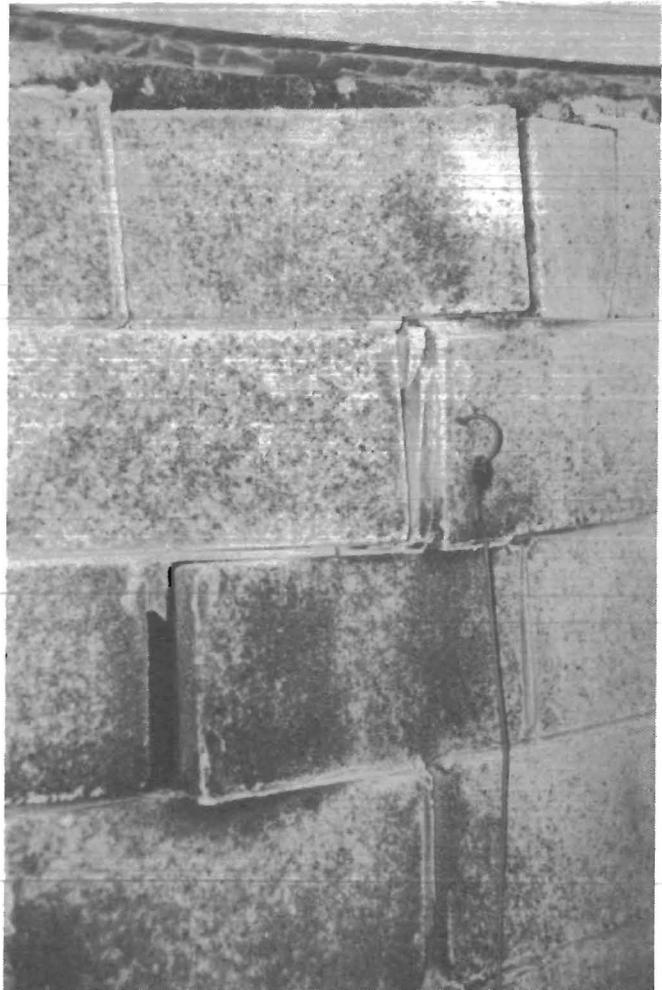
Crack in concrete block of stopping (upper right).
